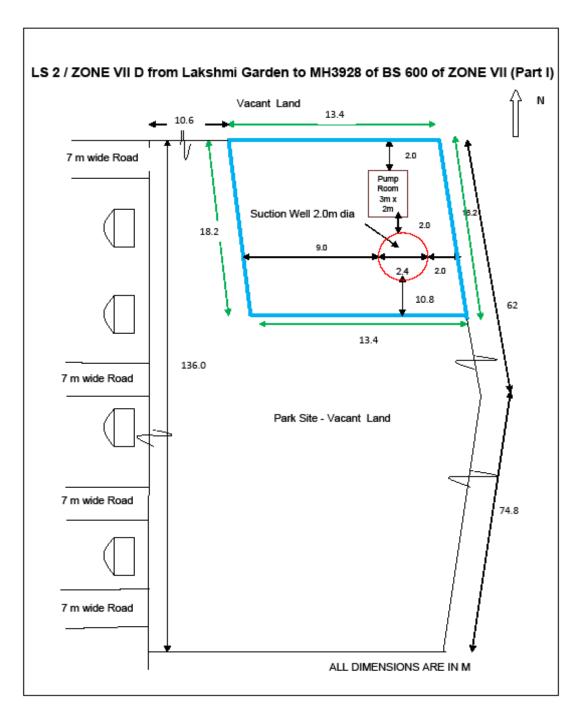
Site Set out Plans – Zone VII (Lakshmi Garden)
